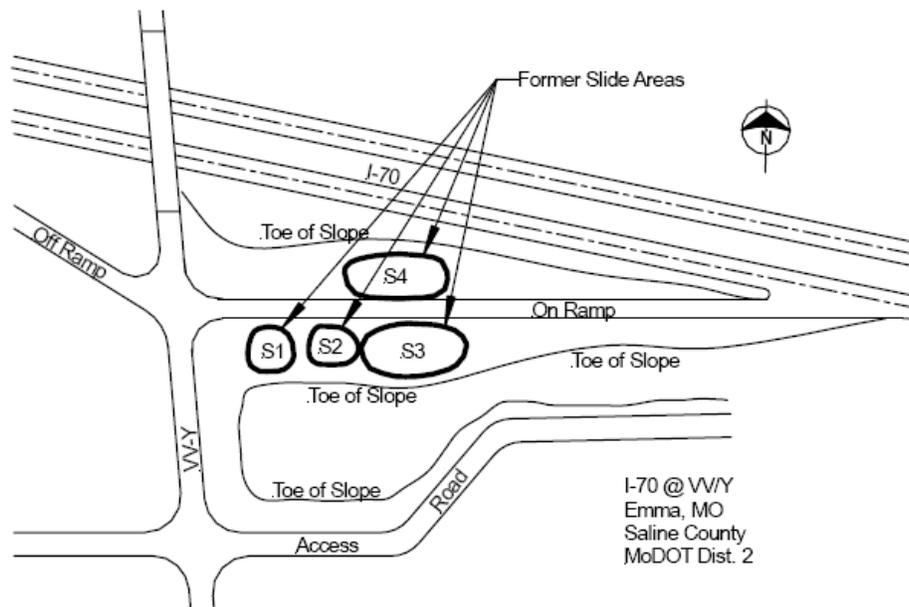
Surficial slope failures (S1, S2, S3, and S4) along I-70 embankment near Emma, Missouri (Loehr and Bowders, 2007).
